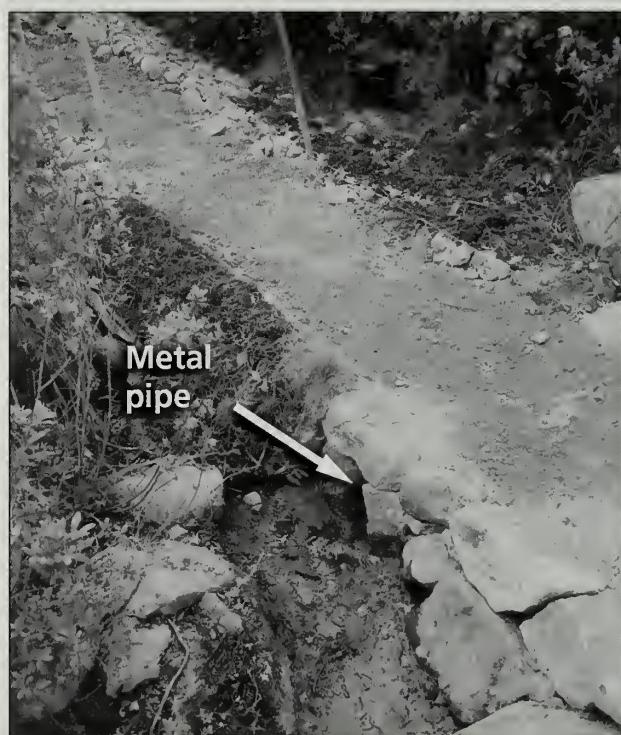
A 2002 finished pipe culvert on the Jordan Pond Path (#39) in which pipe is obscured by insloping lintels and support rocks that are mostly covered with gravel. Lintels tie in to crush wall on one side and retaining wall on the other.
